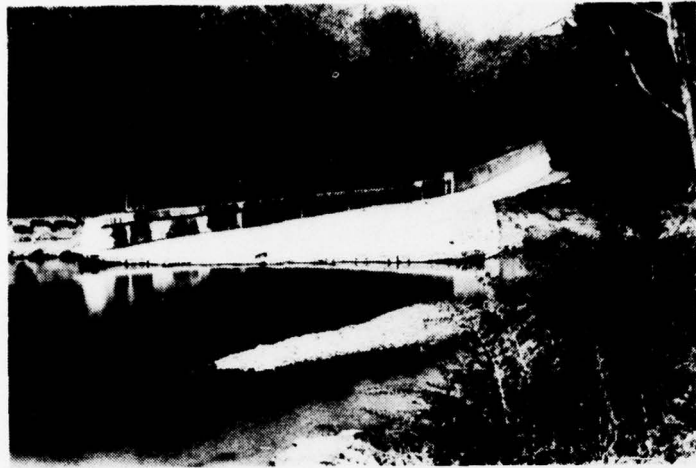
View of spillway chute channel from downstream; Channel area downstream of chute wall has been severely eroded by spillway discharges during storm of November 8, 1977
